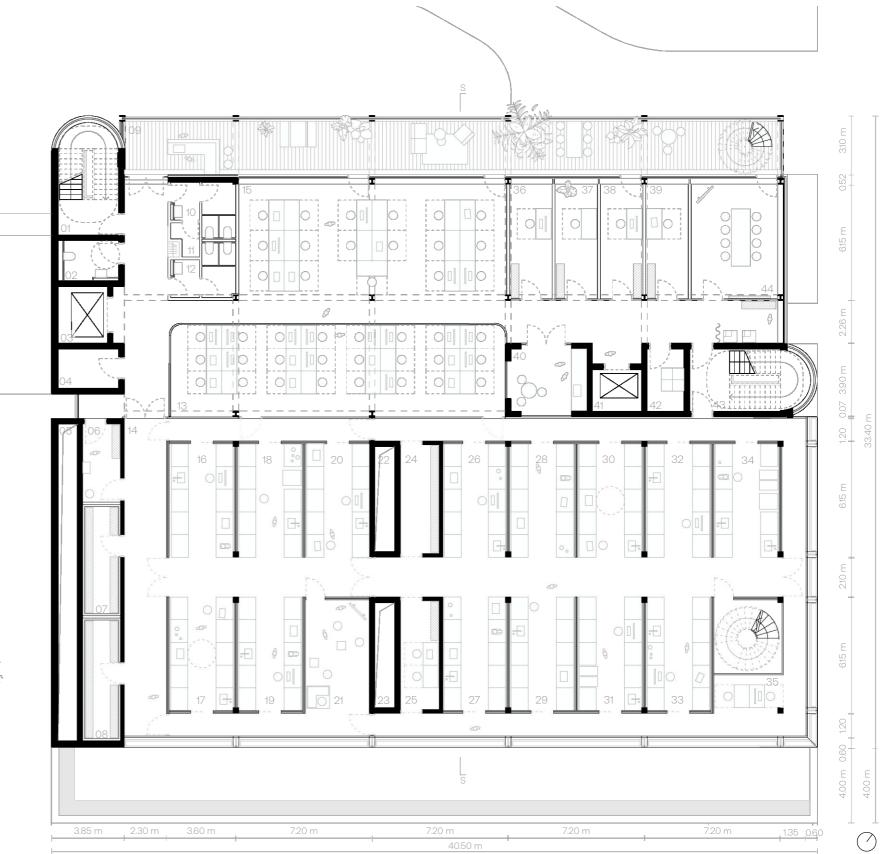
| Fourth Floor | Floor plan | Scale 1:200
